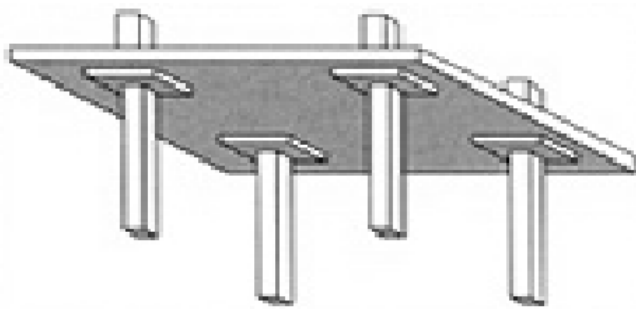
THIS FIGURE SHOWS THE LAYOUT OF A TWO-WAY FLAT PLATE SYSTEM WITH COLUMN CAPITALS. COURTESY OF THE CONCRETE REINFORCING STEEL INSTITUTE.
